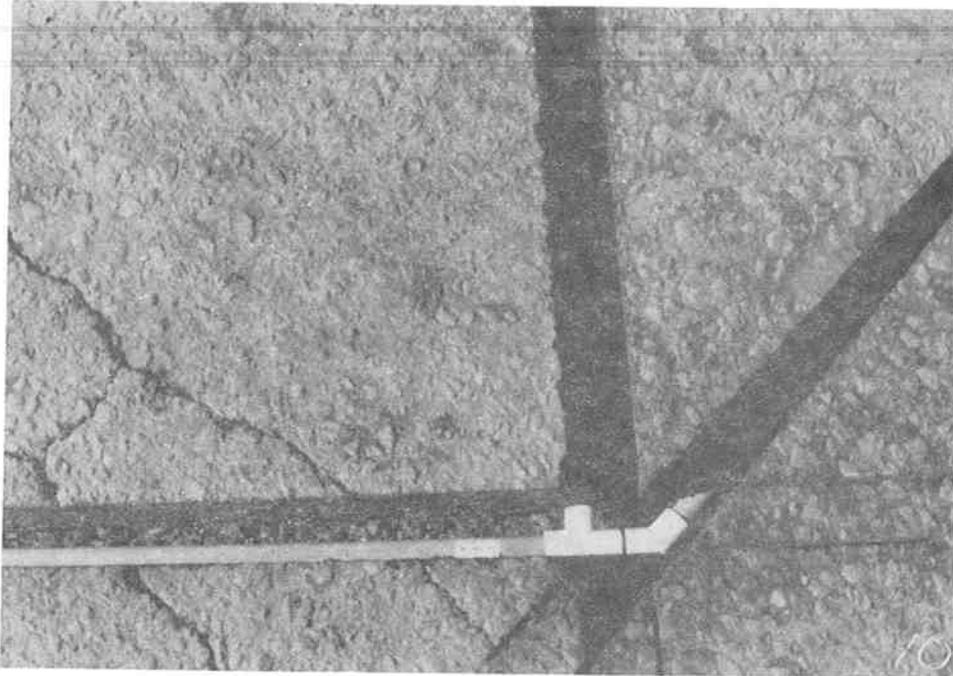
The trench and adjacent work area is thoroughly air dried. We find this step extremely important. It is the key to a good bond between the epoxy backfill, and the existing pavement. If the cut is not completely cleaned and dried, the epoxy will not bond. When the weather turns hot the pavement will expand, close in on the epoxy, and force the epoxy and loop wires up and out of the trench.
